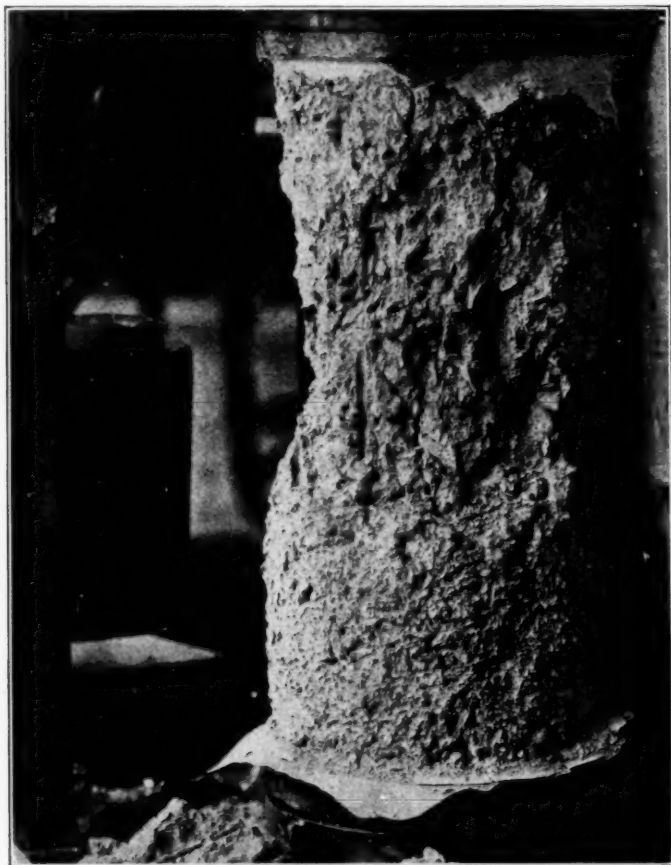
Limestone-Concrete Specimen after Compression Test.
